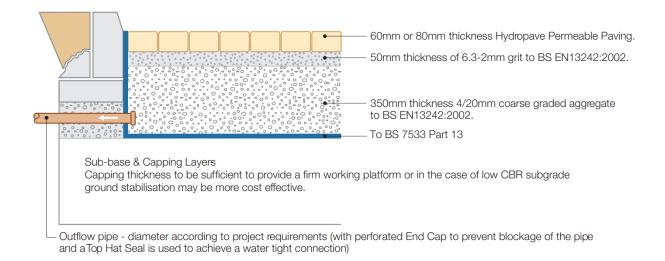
Typical Section Through Permeable Paving in Parking Spaces
